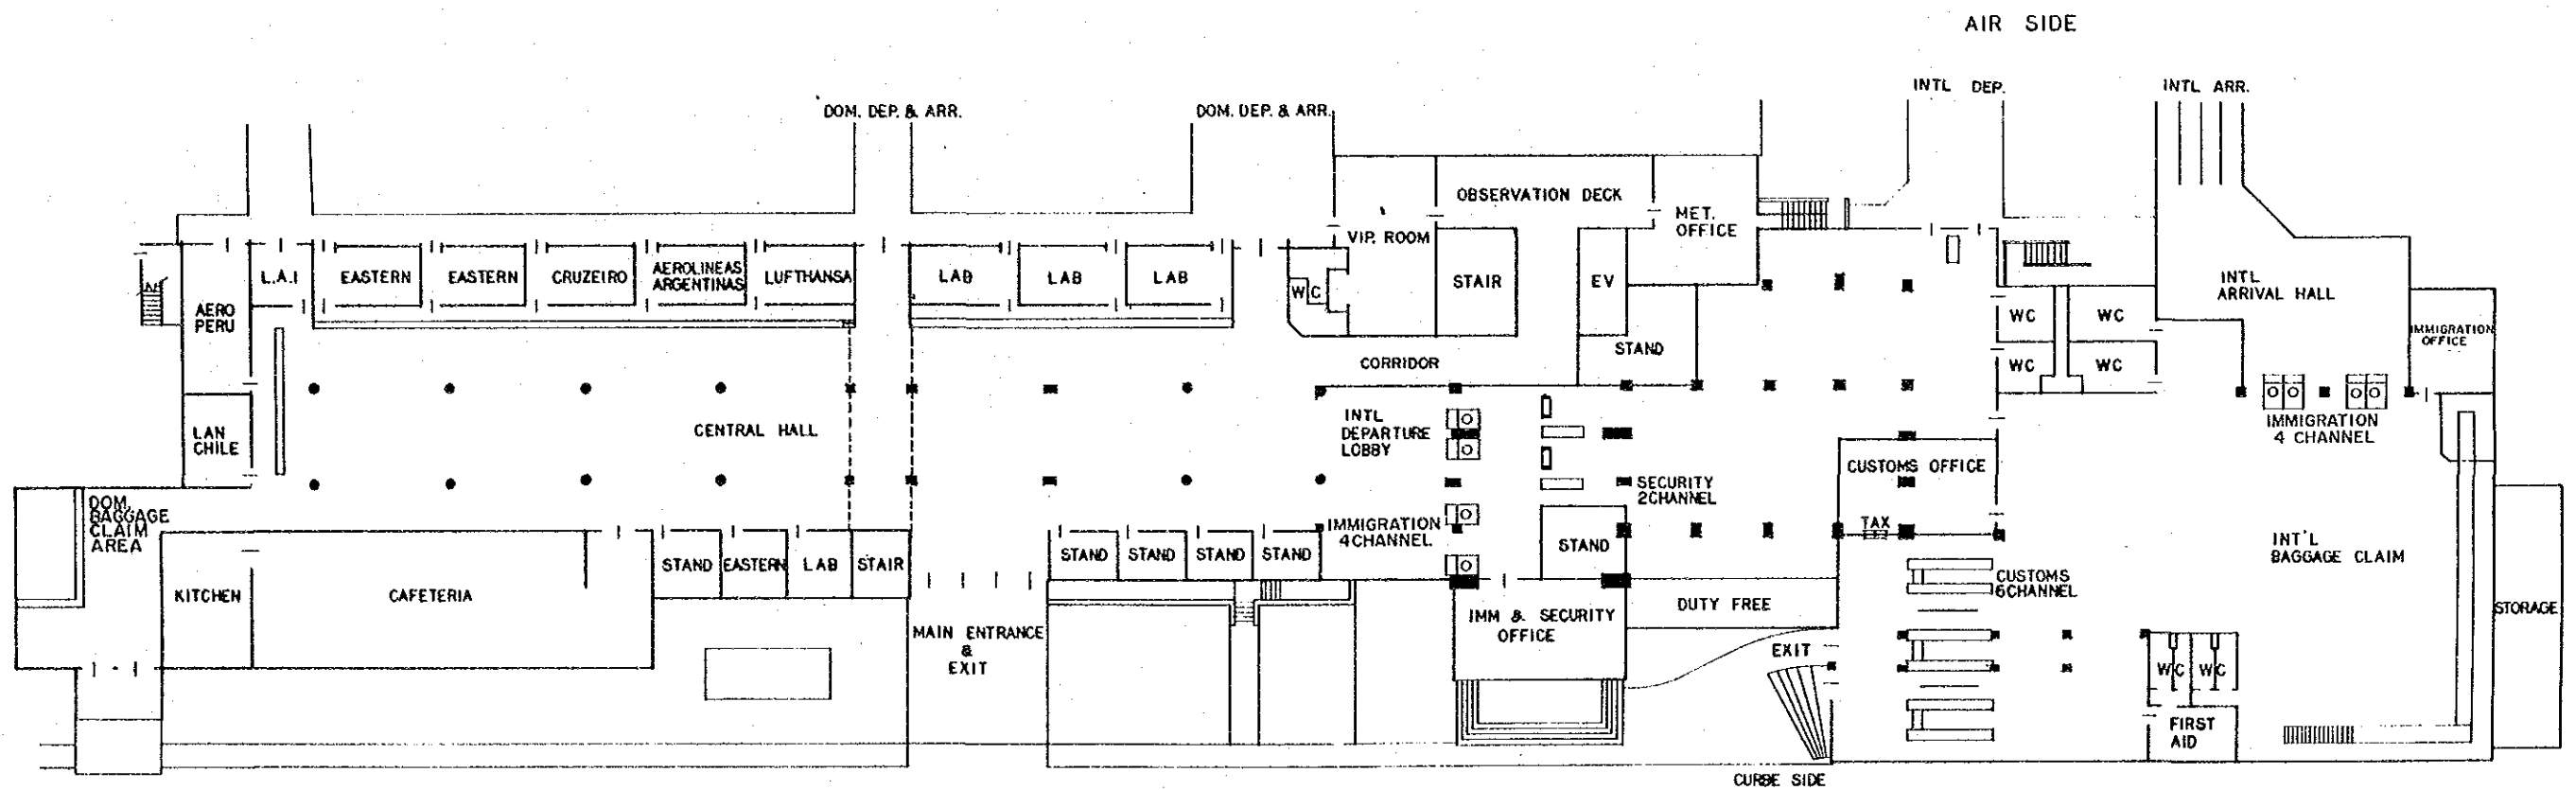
RENOVATION PLAN OF EXISTING PASSENGER TERMINAL BUILDING
